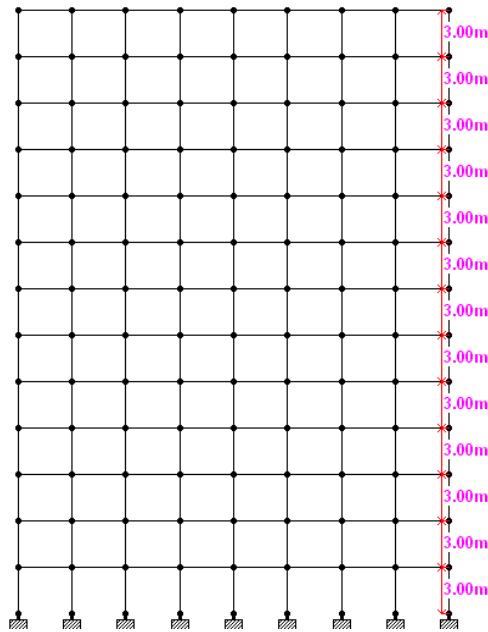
Elevation of Without Infill (Bare Frame) Structure
